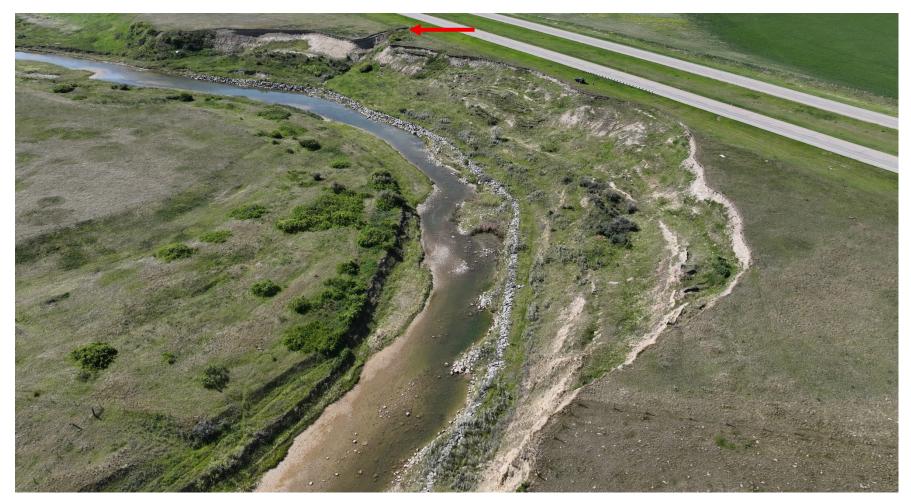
Aerial photo of the site showing the culvert outlet, natural draw, steep poorly vegetated slopes, and riprap armouring along the west shoreline of Willow Creek. Photo taken May 28, 2025, facing west-southwest.
